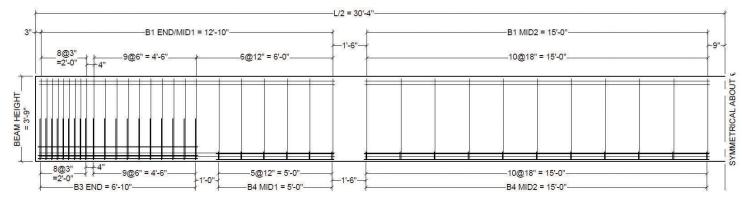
Beam elevation view in a typical WWR submittal showing the required placement of specified welded wire reinforcement mats.
